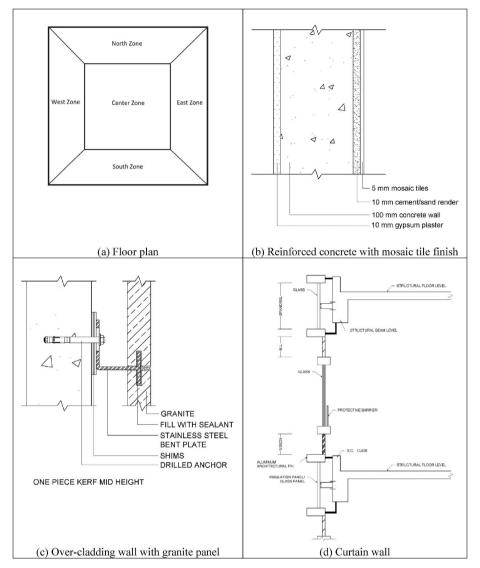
Floor plan of base building case and sectional views of three wall constructions.
